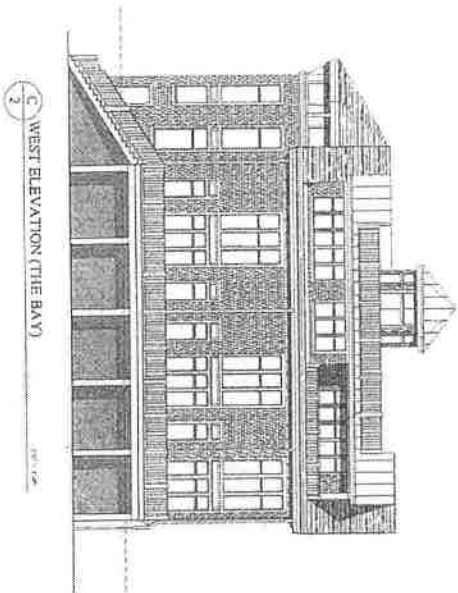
“10<sup>th</sup> Street Wharf” Building Plans
